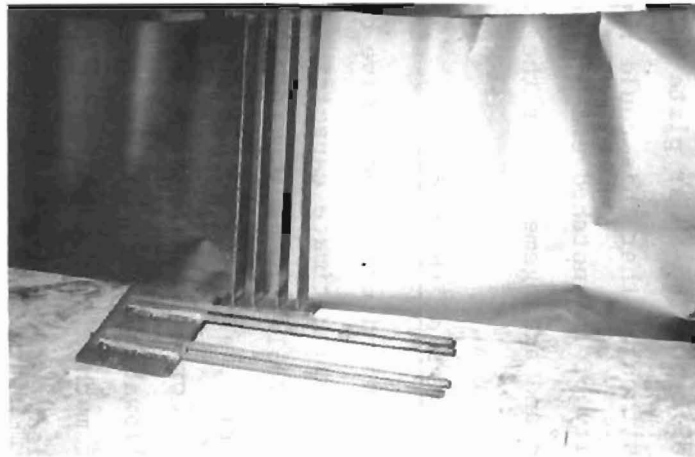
(c). Bearing plate with reinforcements welded.
